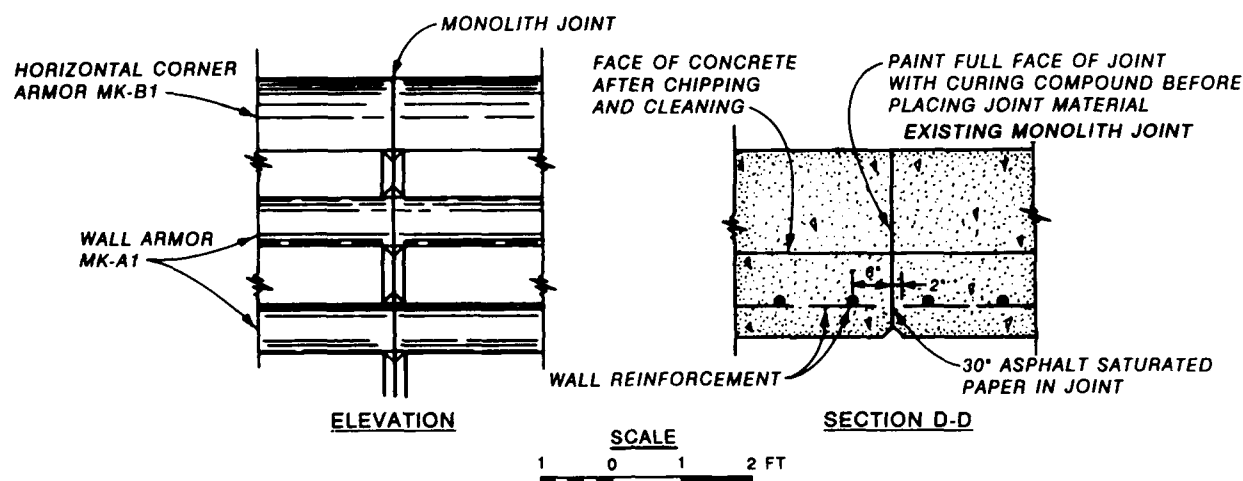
Monolith joint details for the 1978 repair, Dresden Island Lock and Dam
